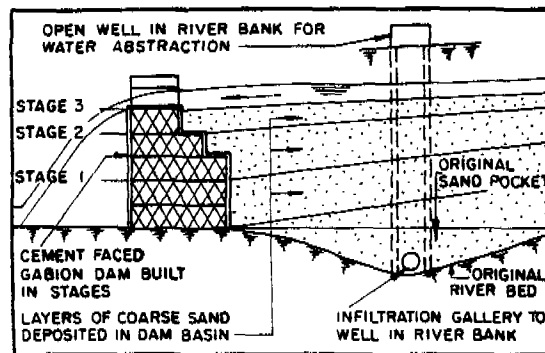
STAGED DEVELOPMENT OF SAND STORAGE DAMS
